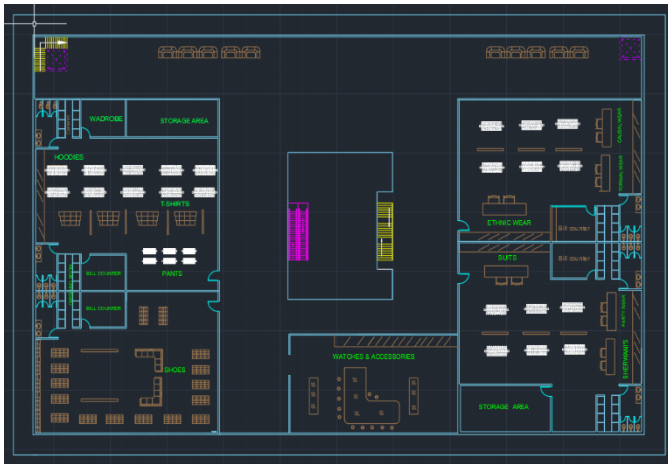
Second Floor Plan Fig 04: Third Floor Plan
